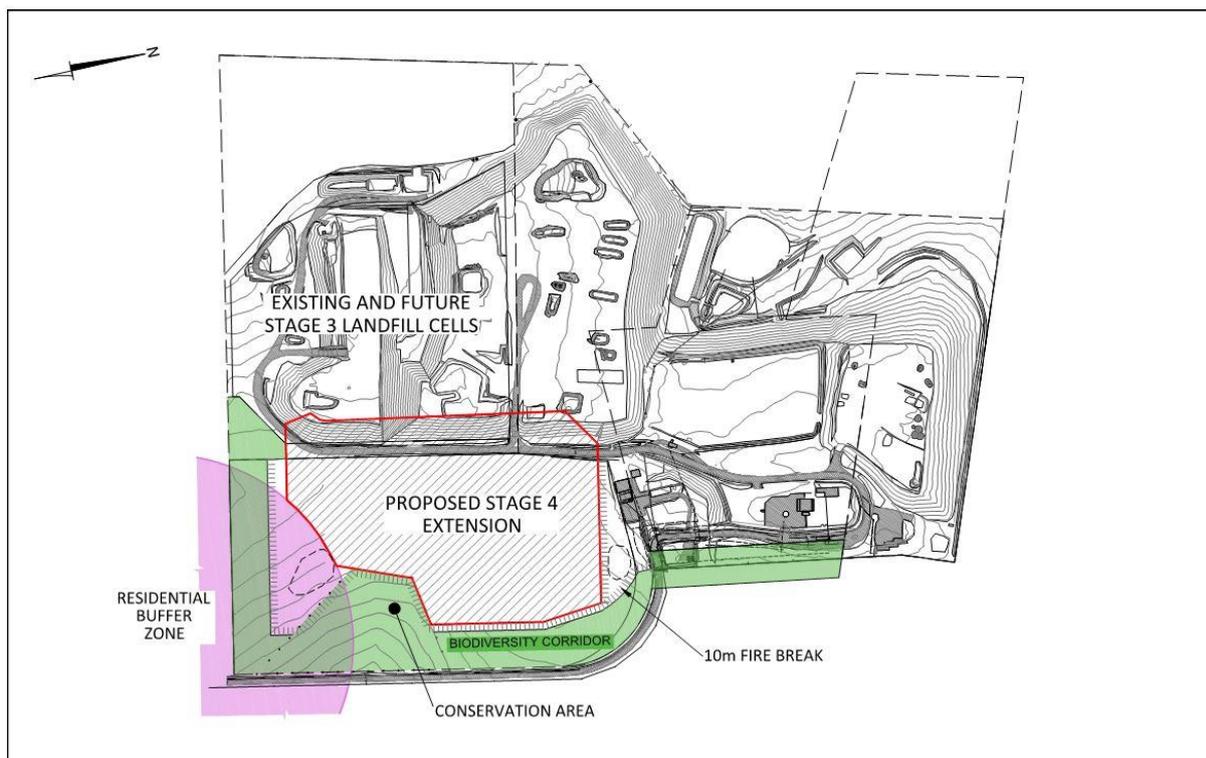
Proposed Stage 4 Landfill Extension Footprint Layout
